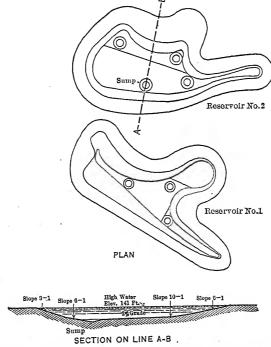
Cincinnati settling reservoirs, plan and cross section.
